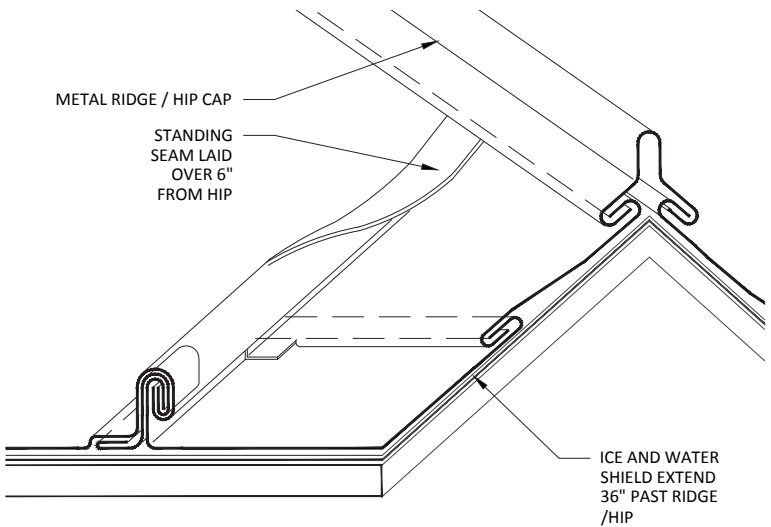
Close-Up Detail of Simple Upstand Type of Hip and Ridge.
